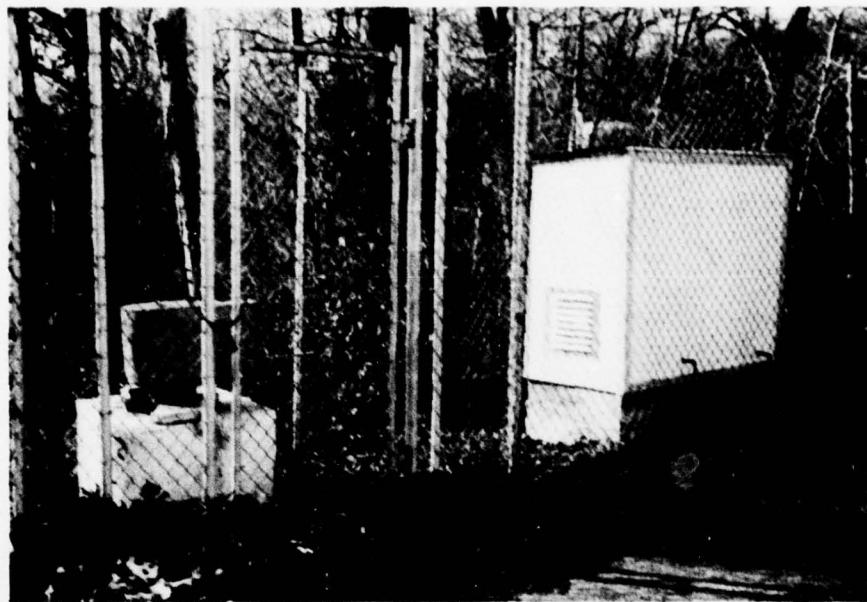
View showing tunnel vent (left) and aerator compressor (right) at crest of dam.
